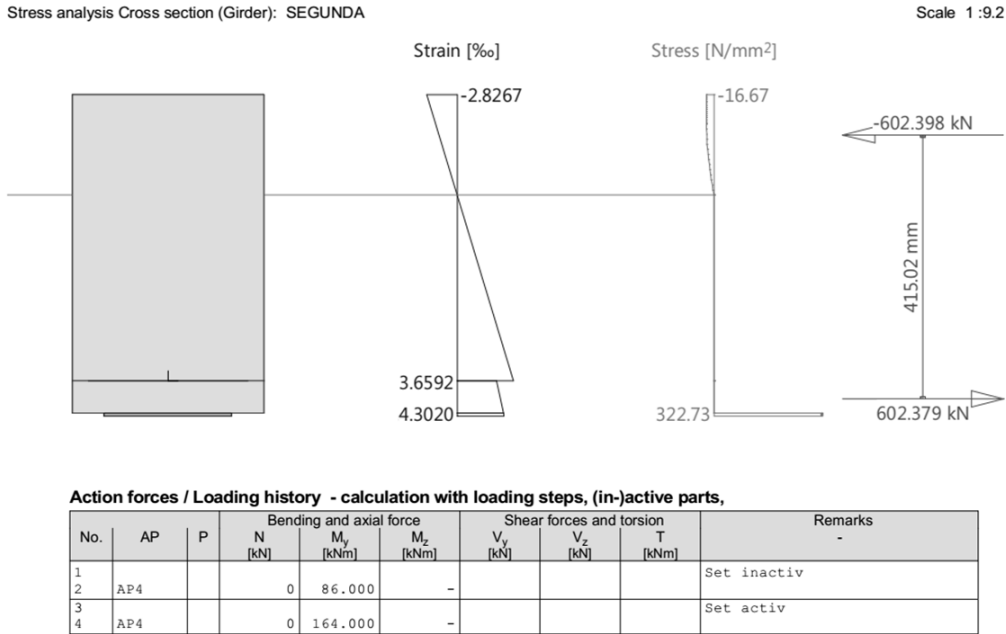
ULS strength of the reinforced section, considering the tensional state of the cross-section for permanent loads, prior the reinforcement installation.
